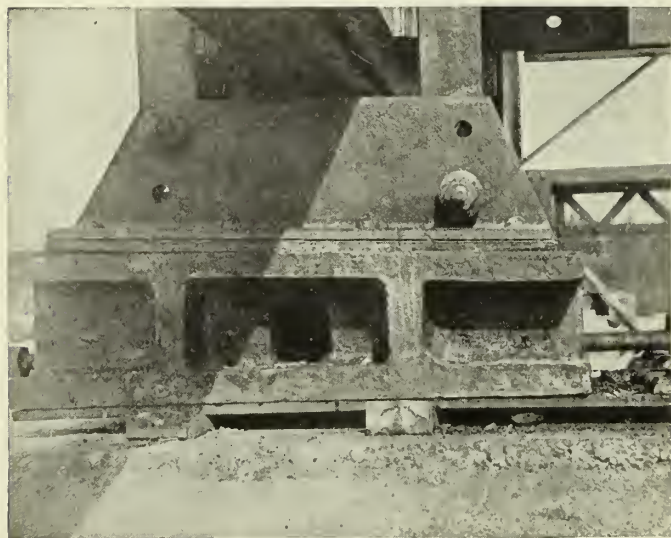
Adjustable Shoe, Used in Reinforcement of Manistee River Viaduct, Pere Marquette R. R.
